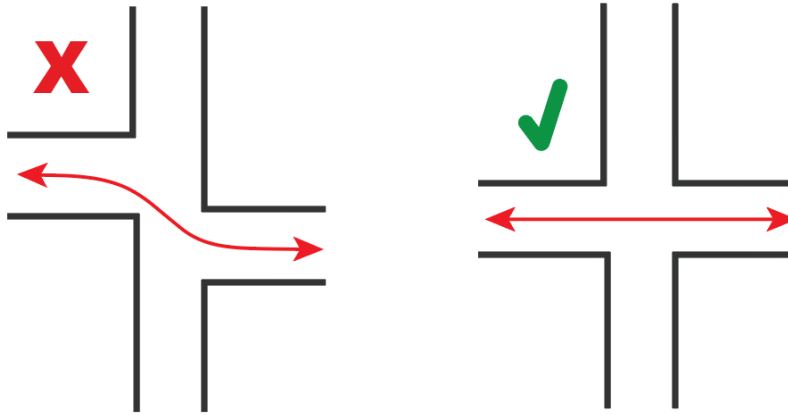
C: Street jogs (left image) are prohibited with straight travel through a four-way intersection (right image) the appropriate intersection type unless a roundabout is approved.
